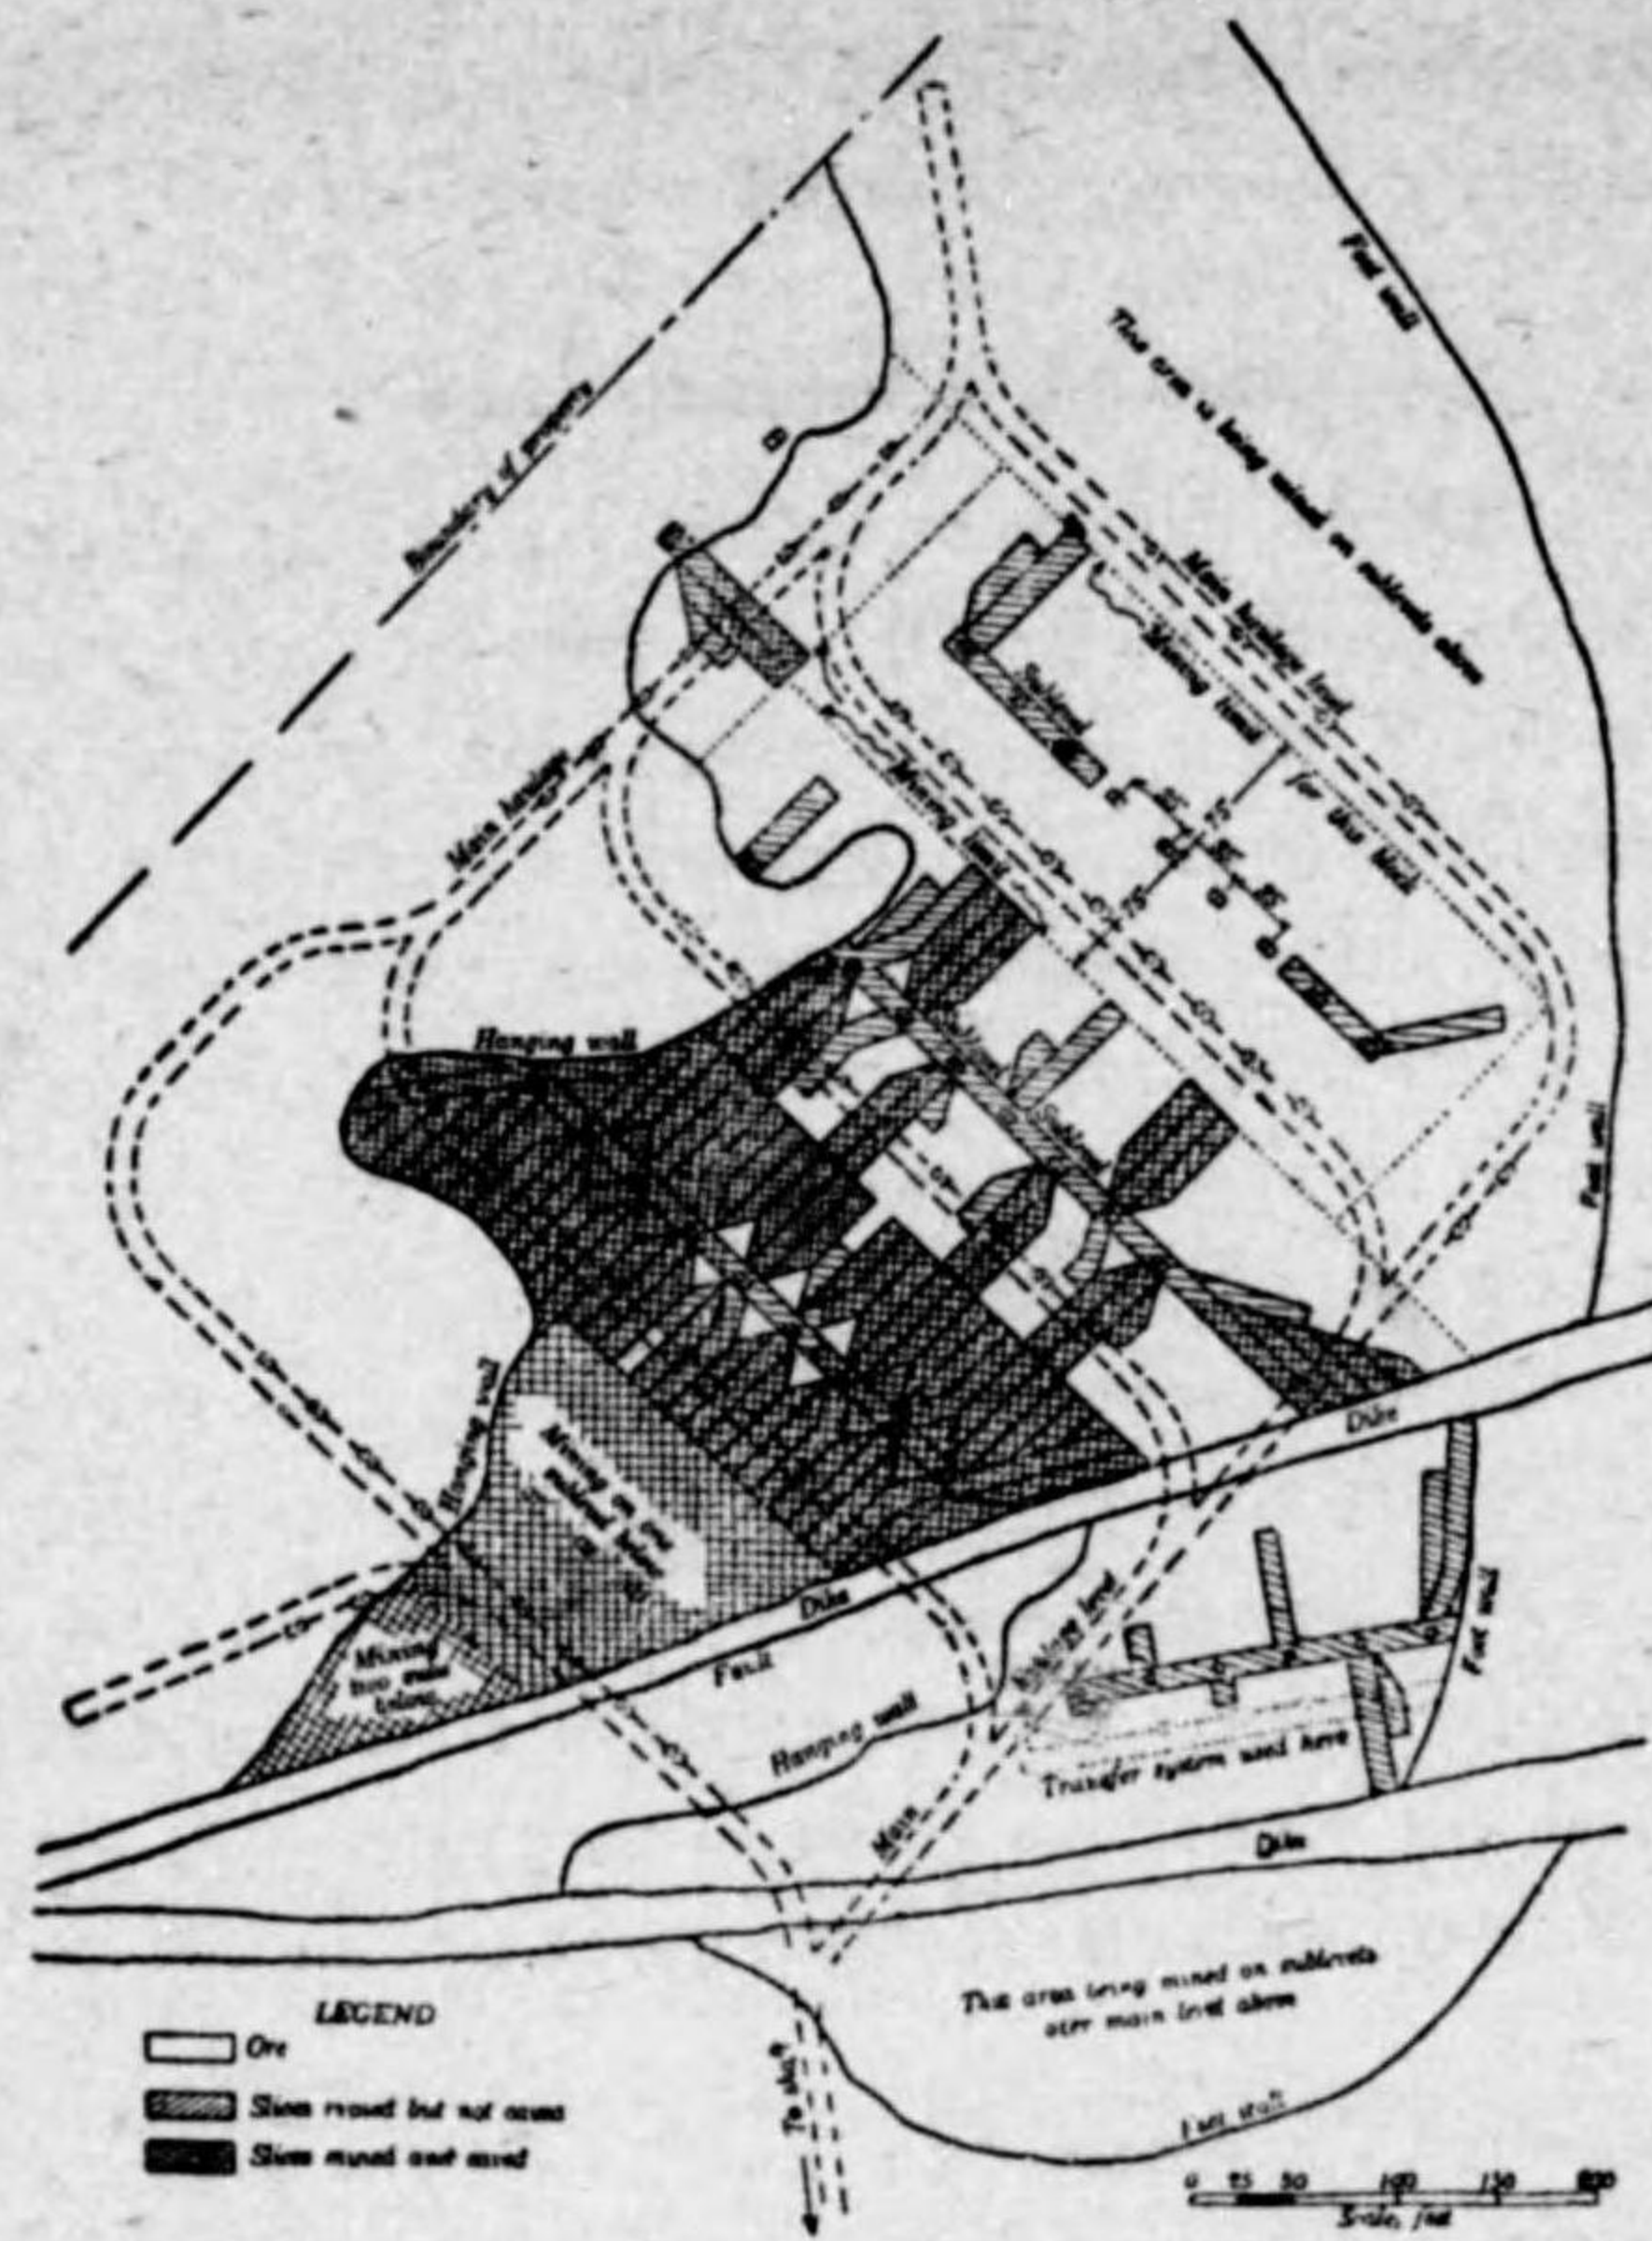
Plan of typical sublevel, Marquette range, Showing mine level development and arrangement of slices in mining blocks
